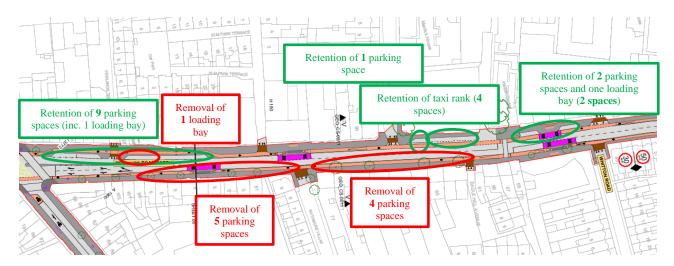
Proposed scheme design on Terenure Road North (between Templeogue Road and Whitton Road)
